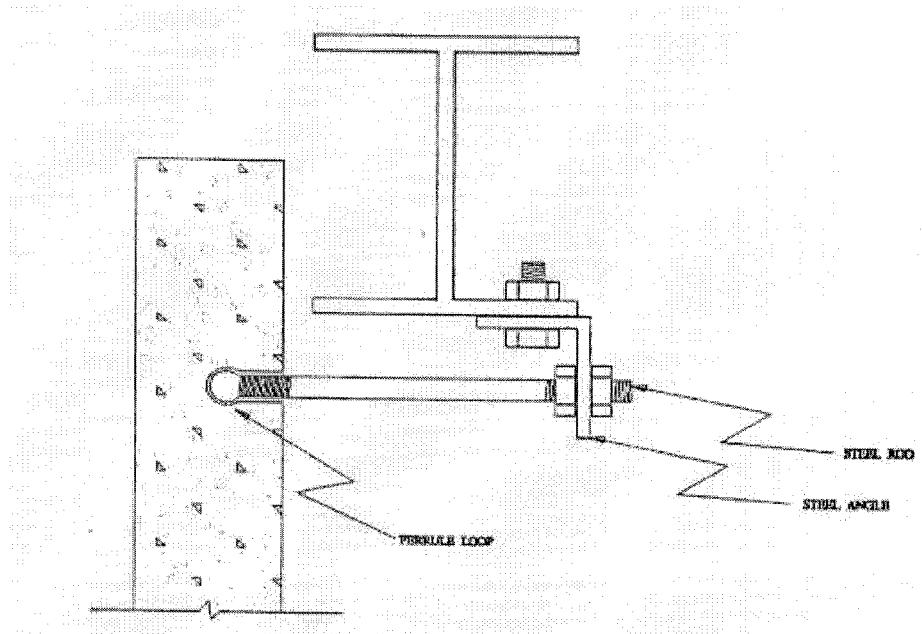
Craig’s Push-Pull Connection Test Fixture (from Craig et al. 1988)
